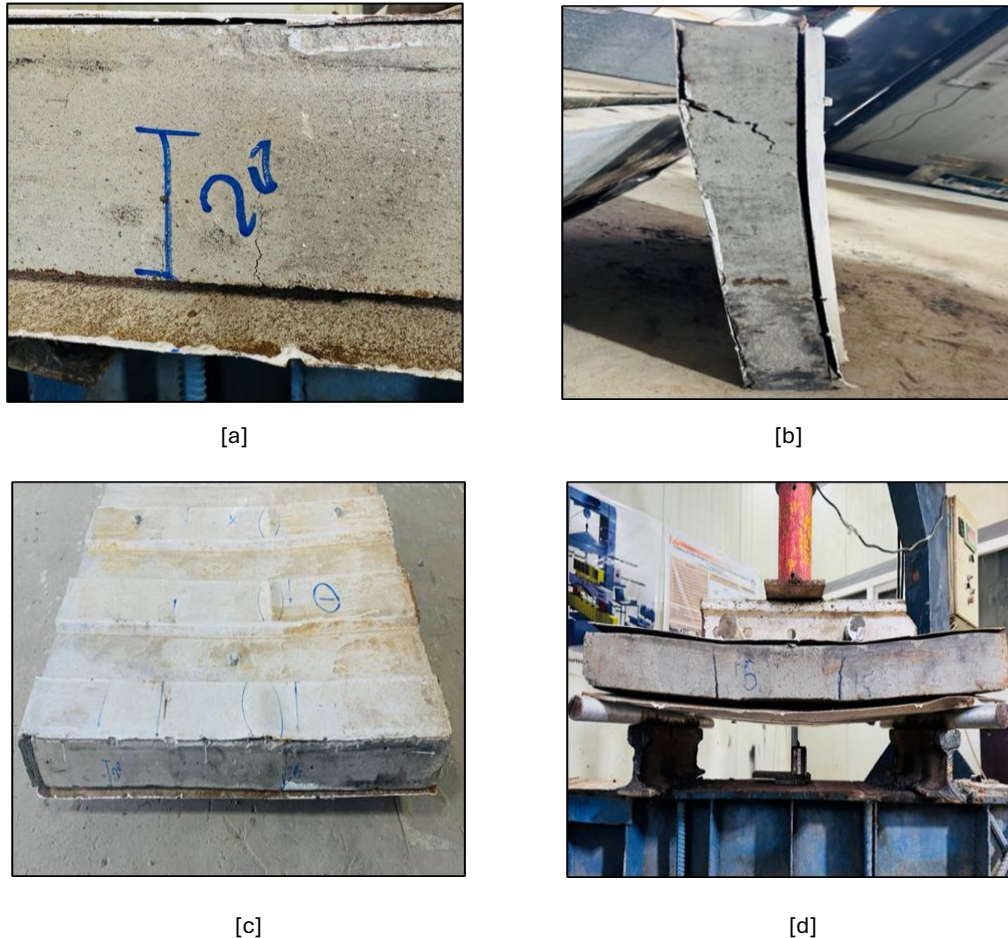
Flexural failure characteristics of the tested sandwich panels, [a] initiation of flexural cracks in the foamed concrete core, [b] face-core debonding between the steel face sheet and foamed concrete core, [c] outward bulging of steel face sheet, [d] flexural bending of the sandwich panel specimen during testing
